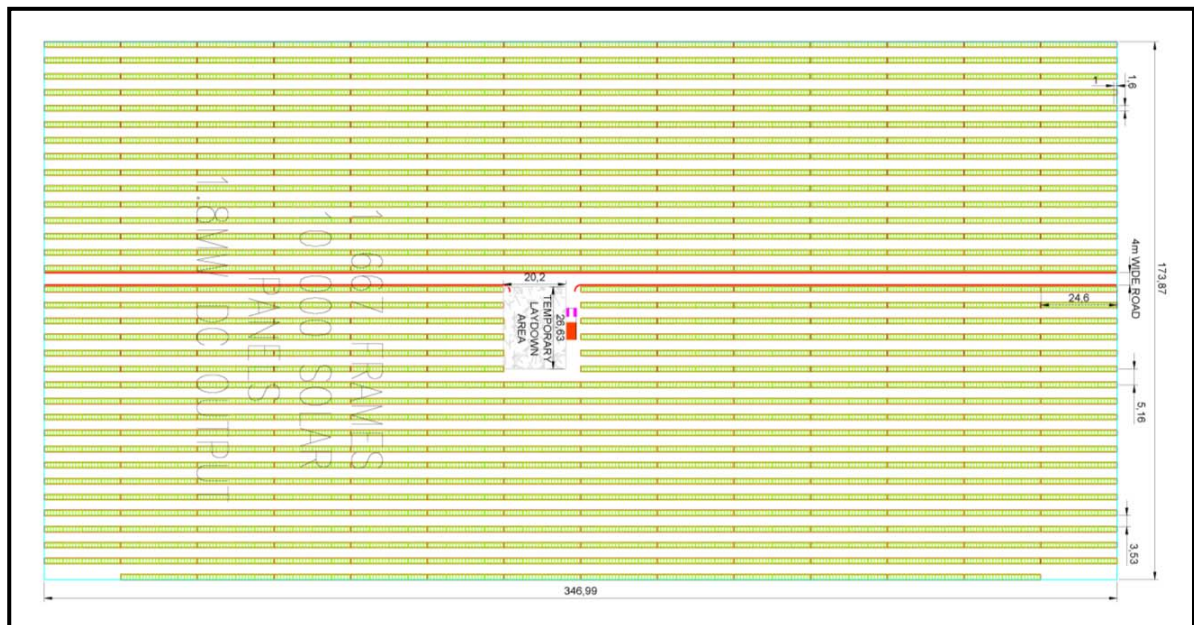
Block layout of layout alternative 2, tracking solar panels (Drawing number P8801 - ELE - DET - 01 - SHT1 - PRE - 00, Appendix G)
